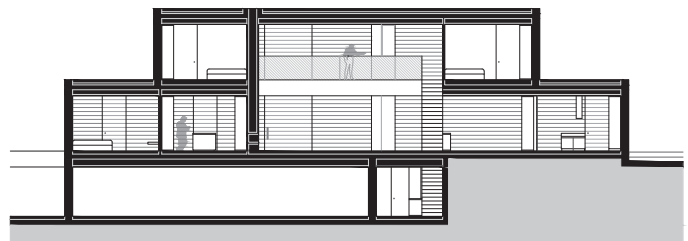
South-East elevation and longitudinal section. 2017. Produced by Gaspar Ferrer Soler /
